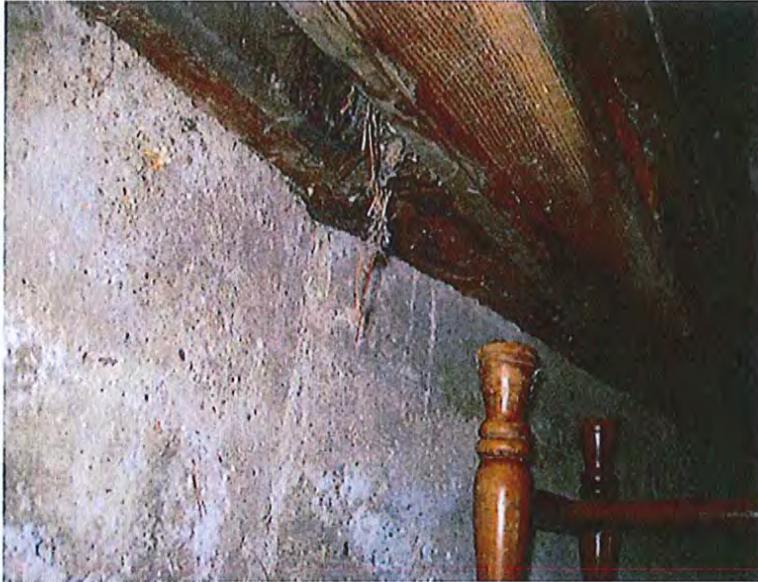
Bend in concrete back wall of garage with straight wood framing above; taken inside the garage
